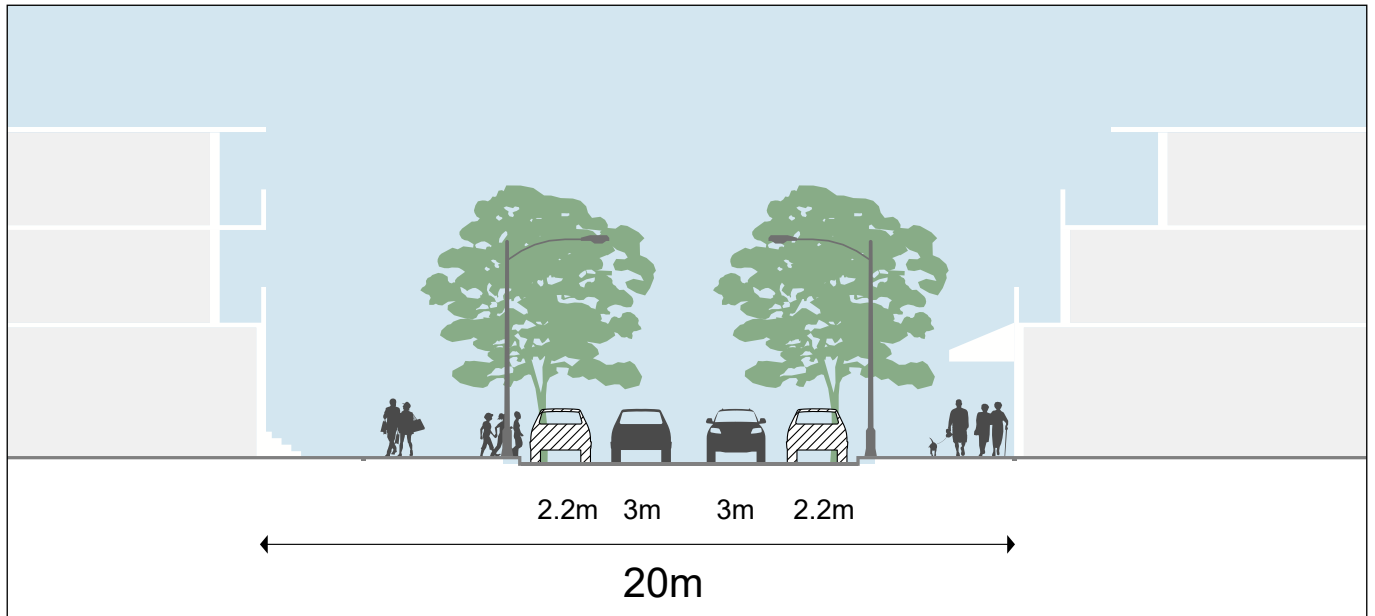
Street Type 1: Two way traffic movement on local streets with on-street parking (20m)
